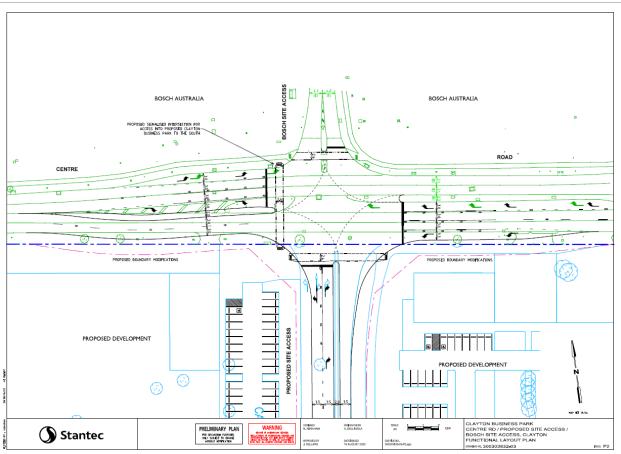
Centre Road/Proposed Development Site Access Signalised Intersection
